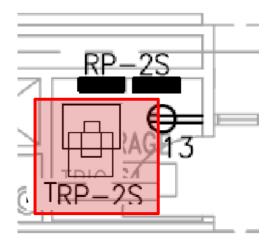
Third Floor Electrical Room Transformer Location
